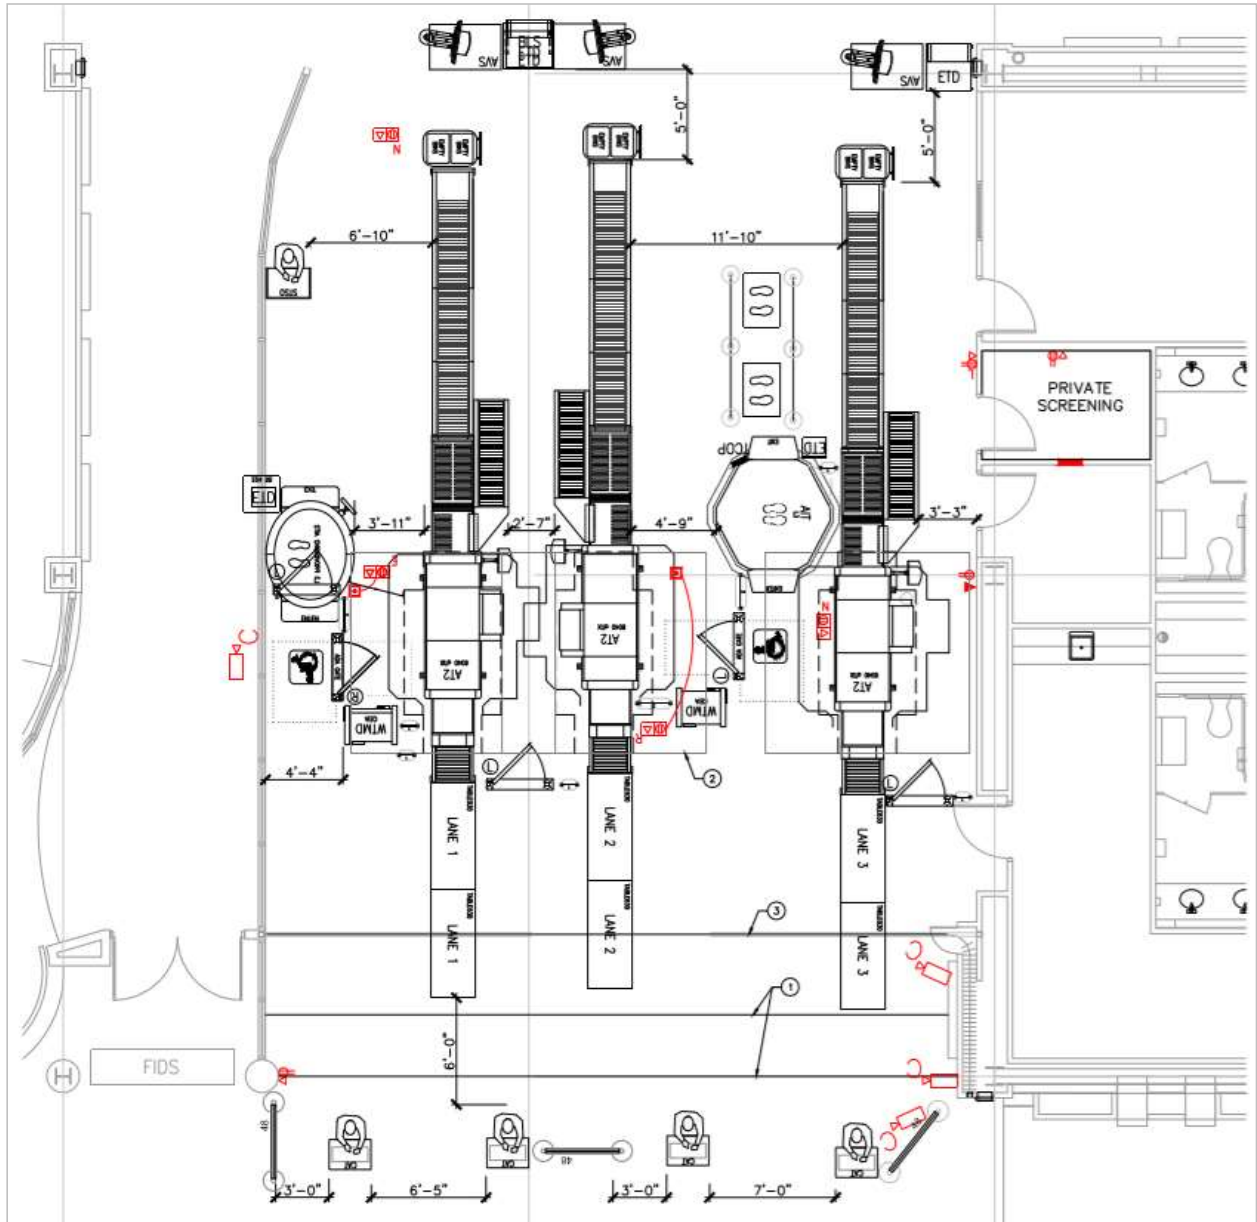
Passenger Terminal Building Floor plan – Mezzanine
